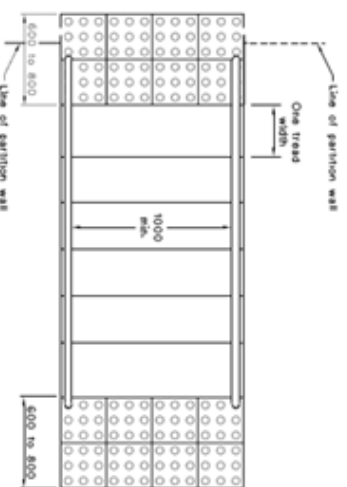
(B). STAIRWAY LOCATION AND HANDRAIL EXTENSIONS AT END OF STAIRWAY OTHER THAN AT LINE OF BOUNDARY
